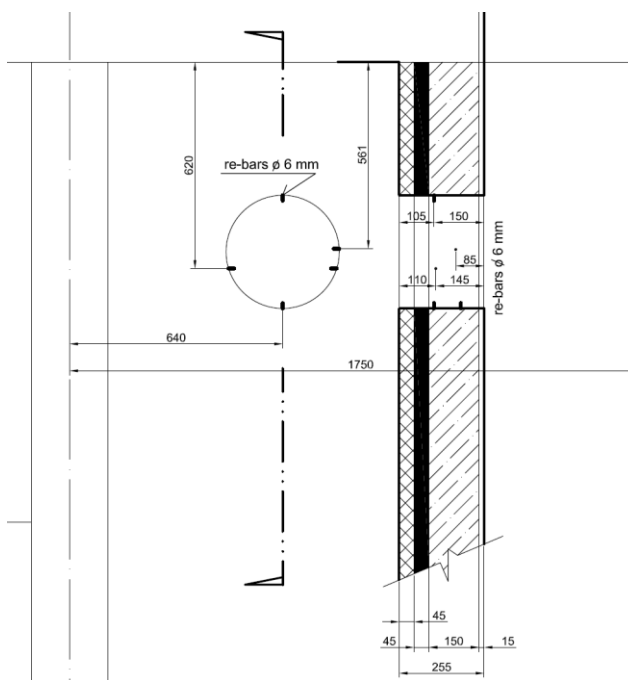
Structure of the wall in the position of a secondarily placed ventilation.
